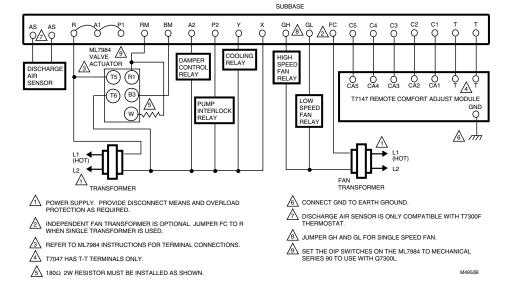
Q7300L hookup for two-stage heating with three-position ML7984 Valve Actuator/V5013 Valve and one-stage cooling.
